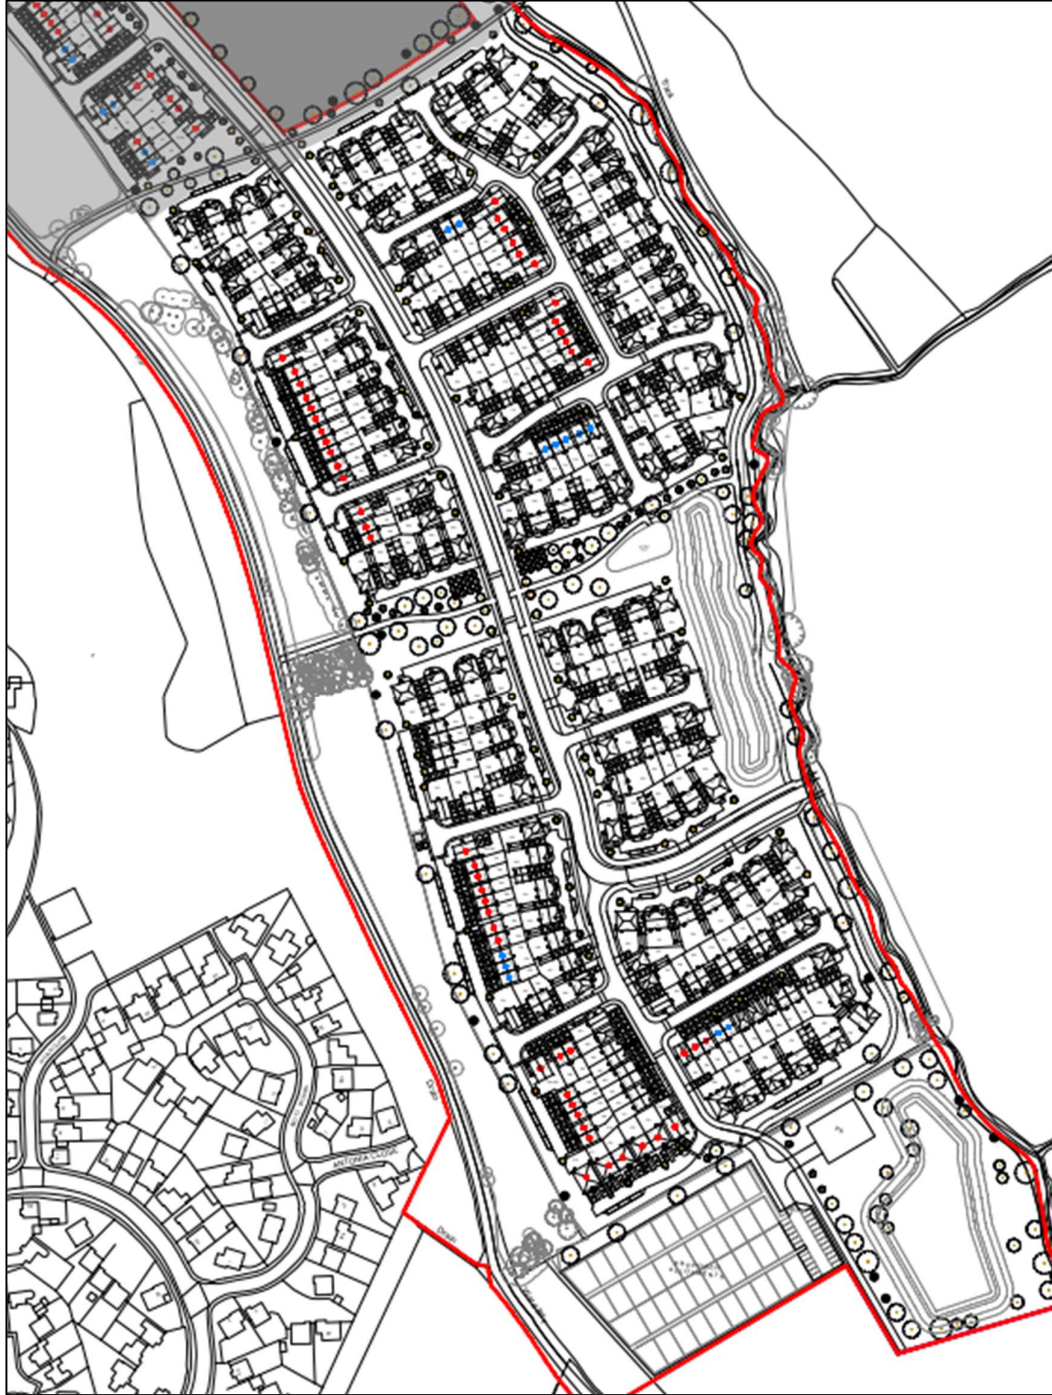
Site Layout Extract (Source: Bloor Homes Ref. EA232-PD-003)
